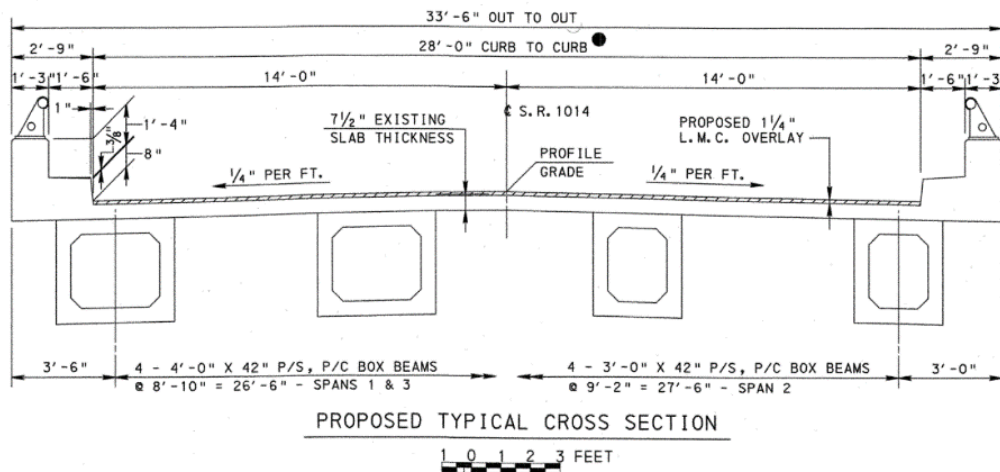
As-Built Plan (Typical Cross Section View) Bridge No. 22383
